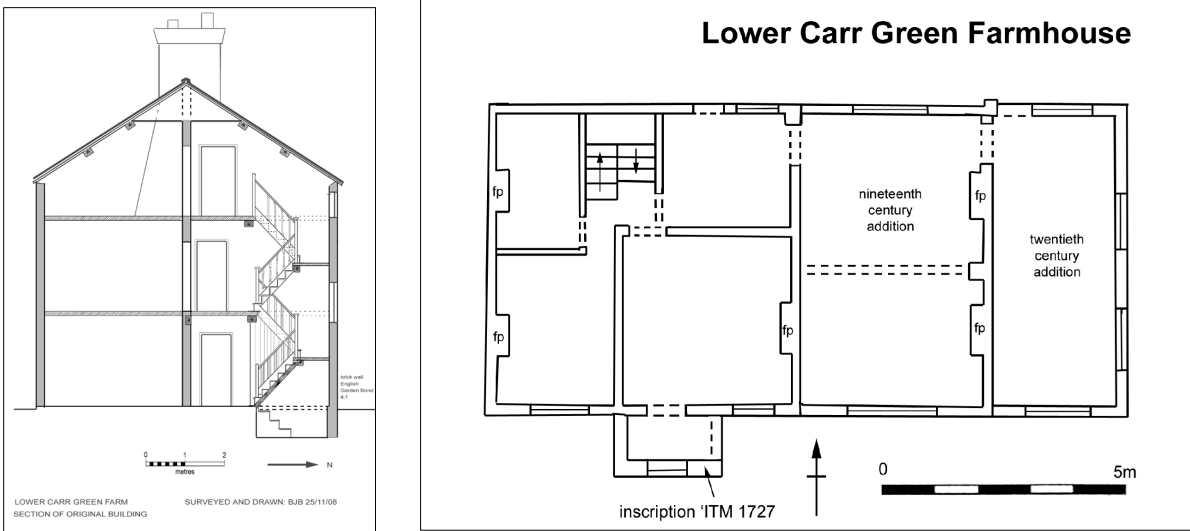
Lower Carr Green Farmhouse southern elevation and plan.
